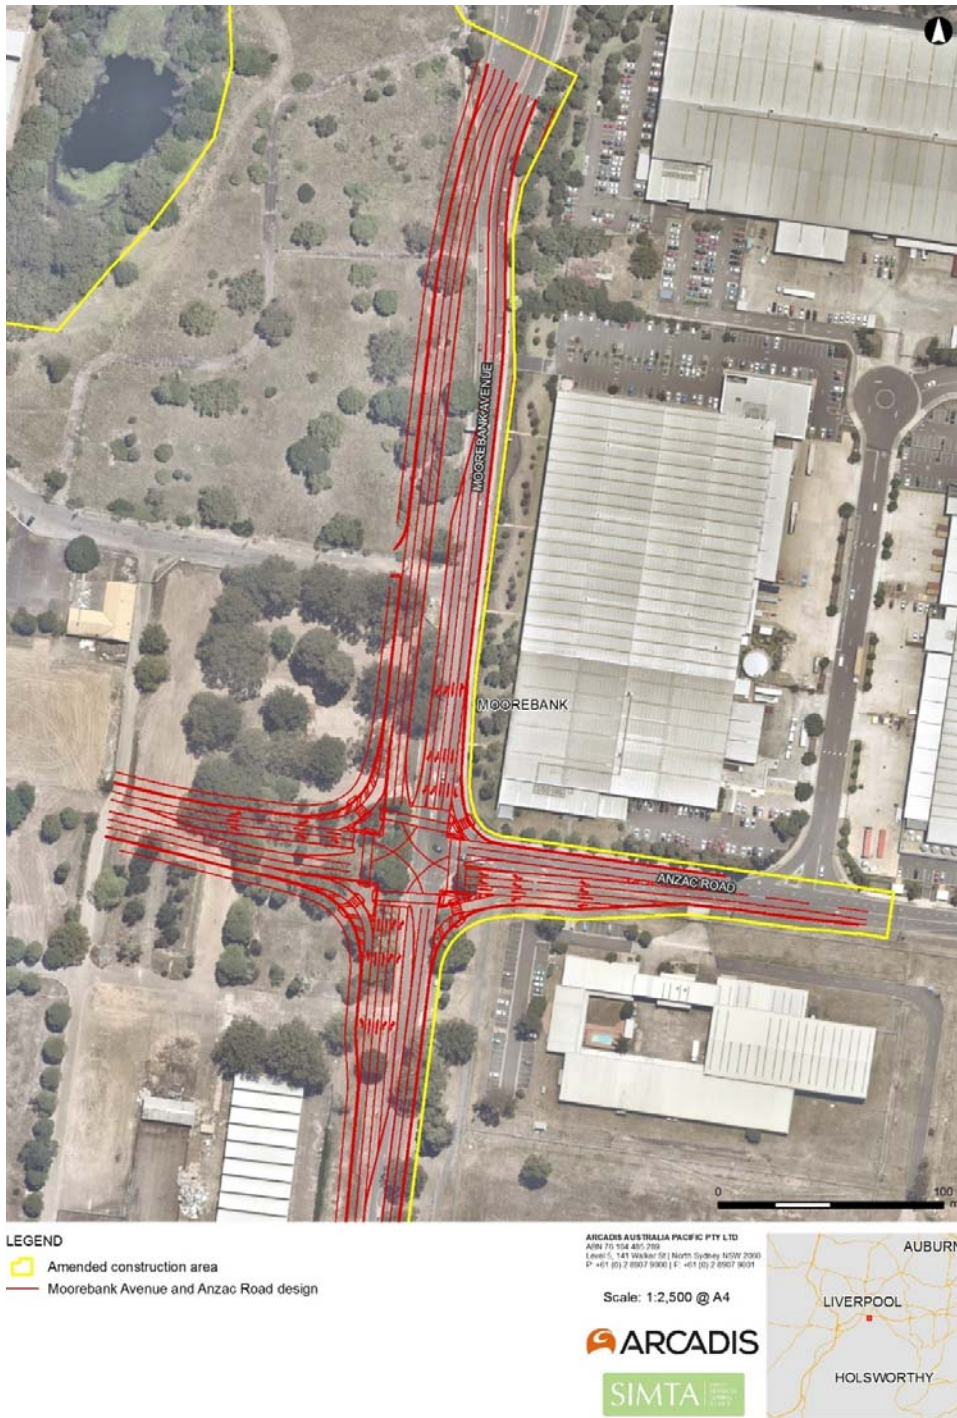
Moorebank Avenue/Anzac Road upgraded intersection layout
